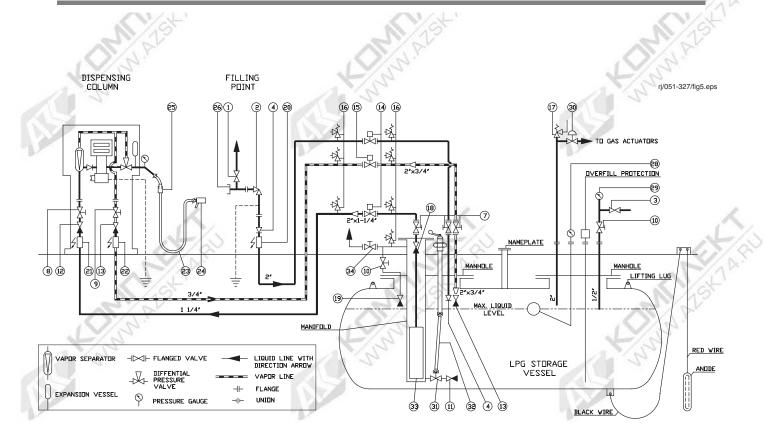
Typical scheme for an underground LPG storage tank with vertical submersible pump
